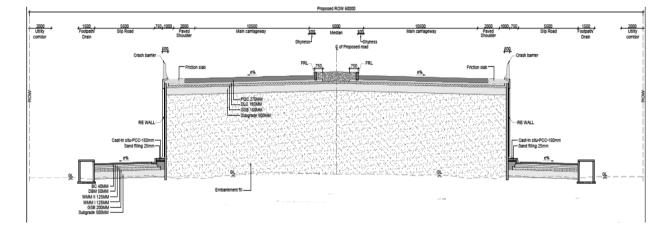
TCS-6B Typical Four Lane Underpass Cross Section with Service Roads in The Existing Road
